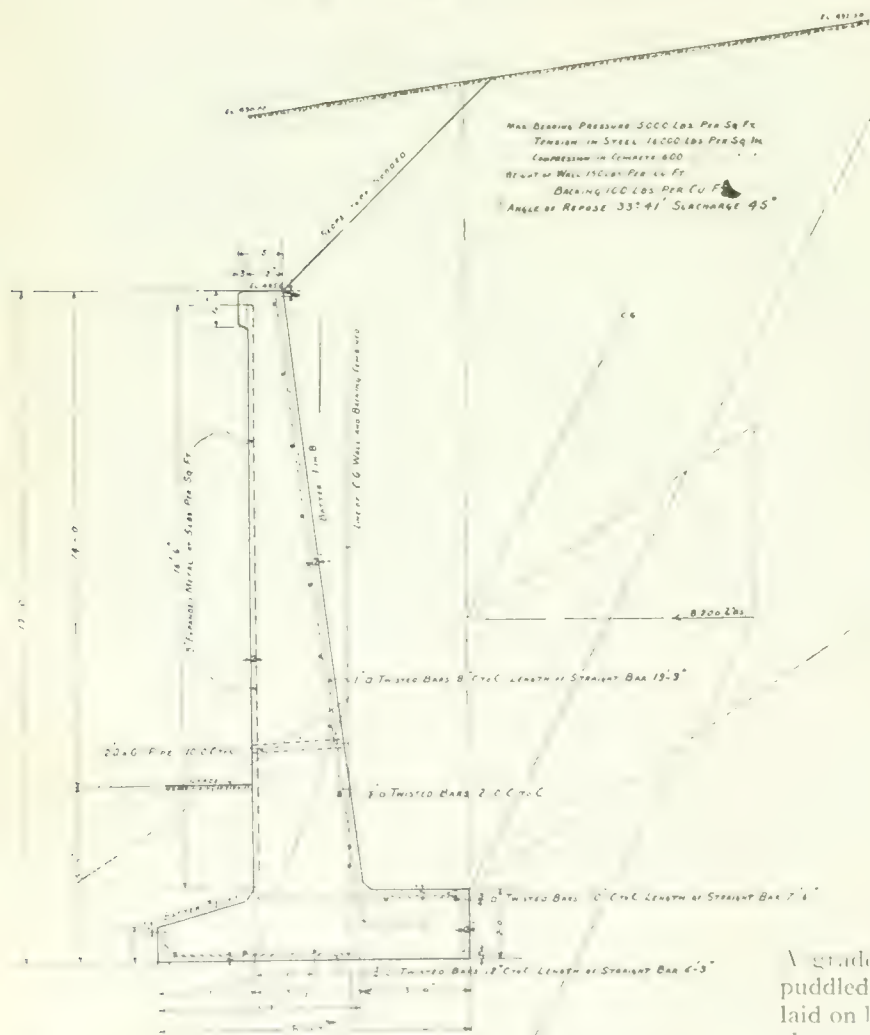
Detail of Reinforced Concrete Section of Wall.
